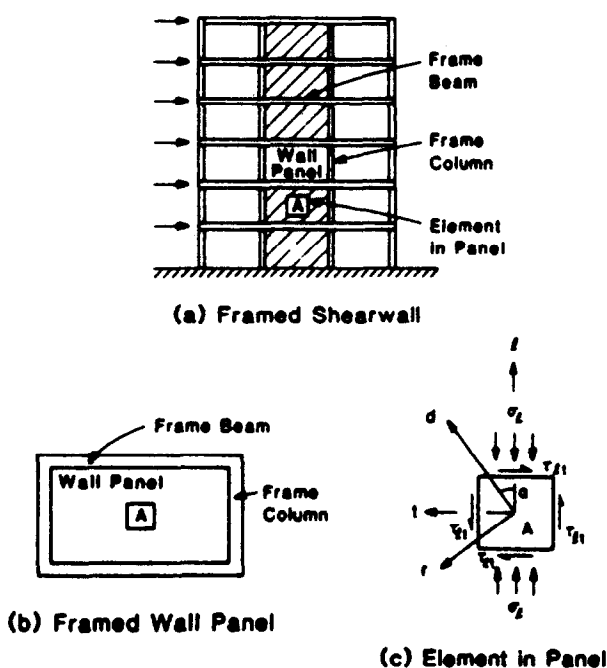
Framed shear walls. (a) Framed shearwall, (b) framed wall panel and (c) element in panel.
